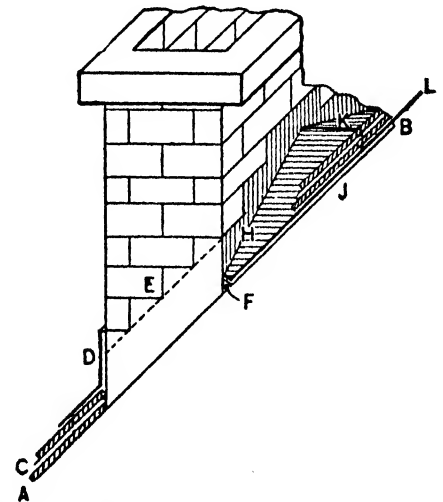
Flashing Around a Chimney on a Shingle Roof, Showing Cant Board in Rear
